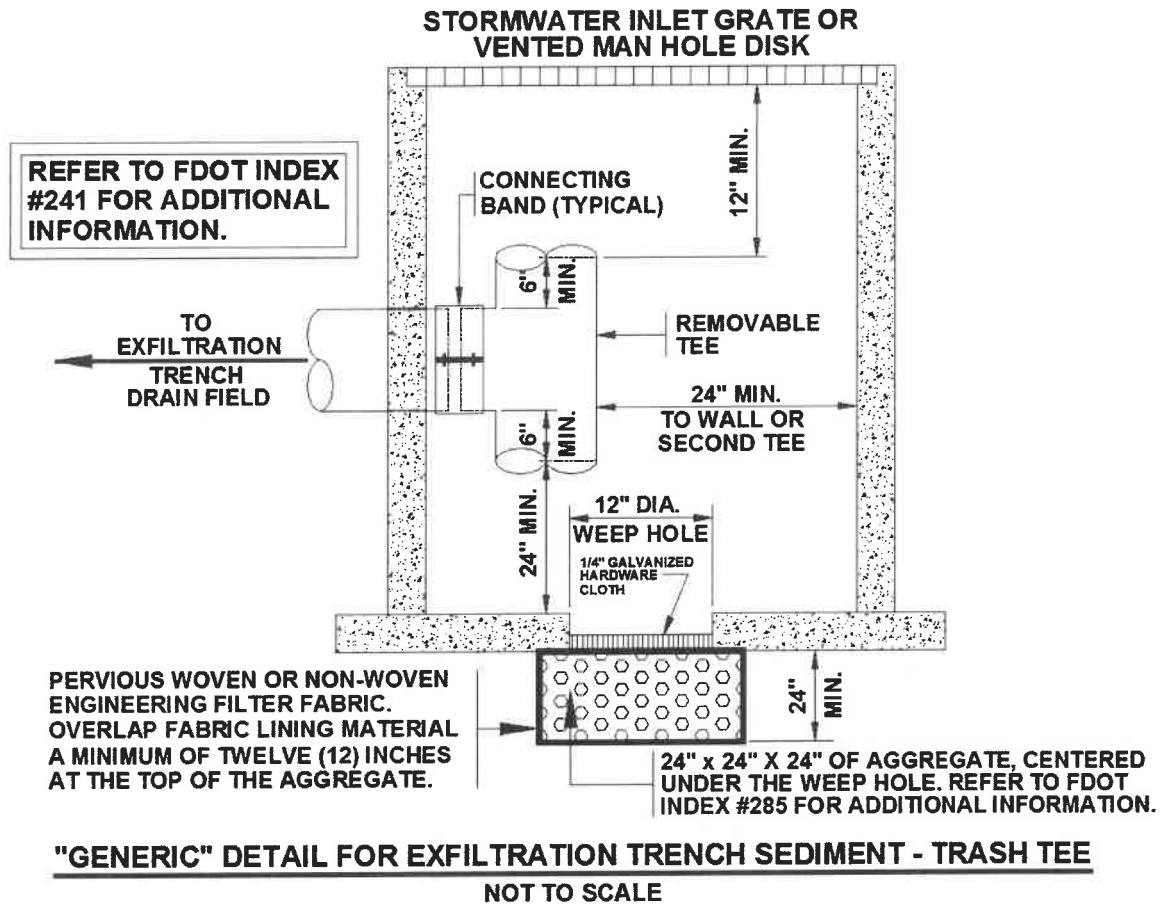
Generic Detail for a Typical Exfiltration Trench Trash Tee
